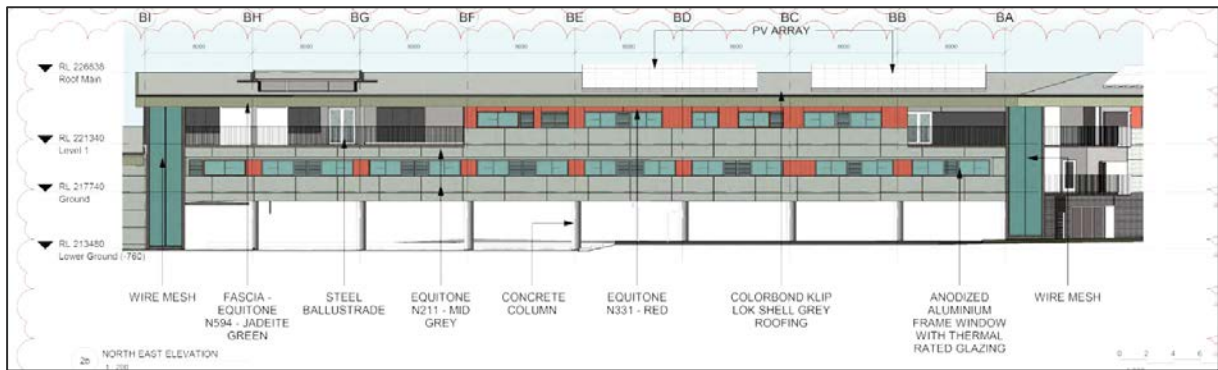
| Proposed northern elevation of main building (western side) (source: Section 4.55 Modification Application, 2019)
